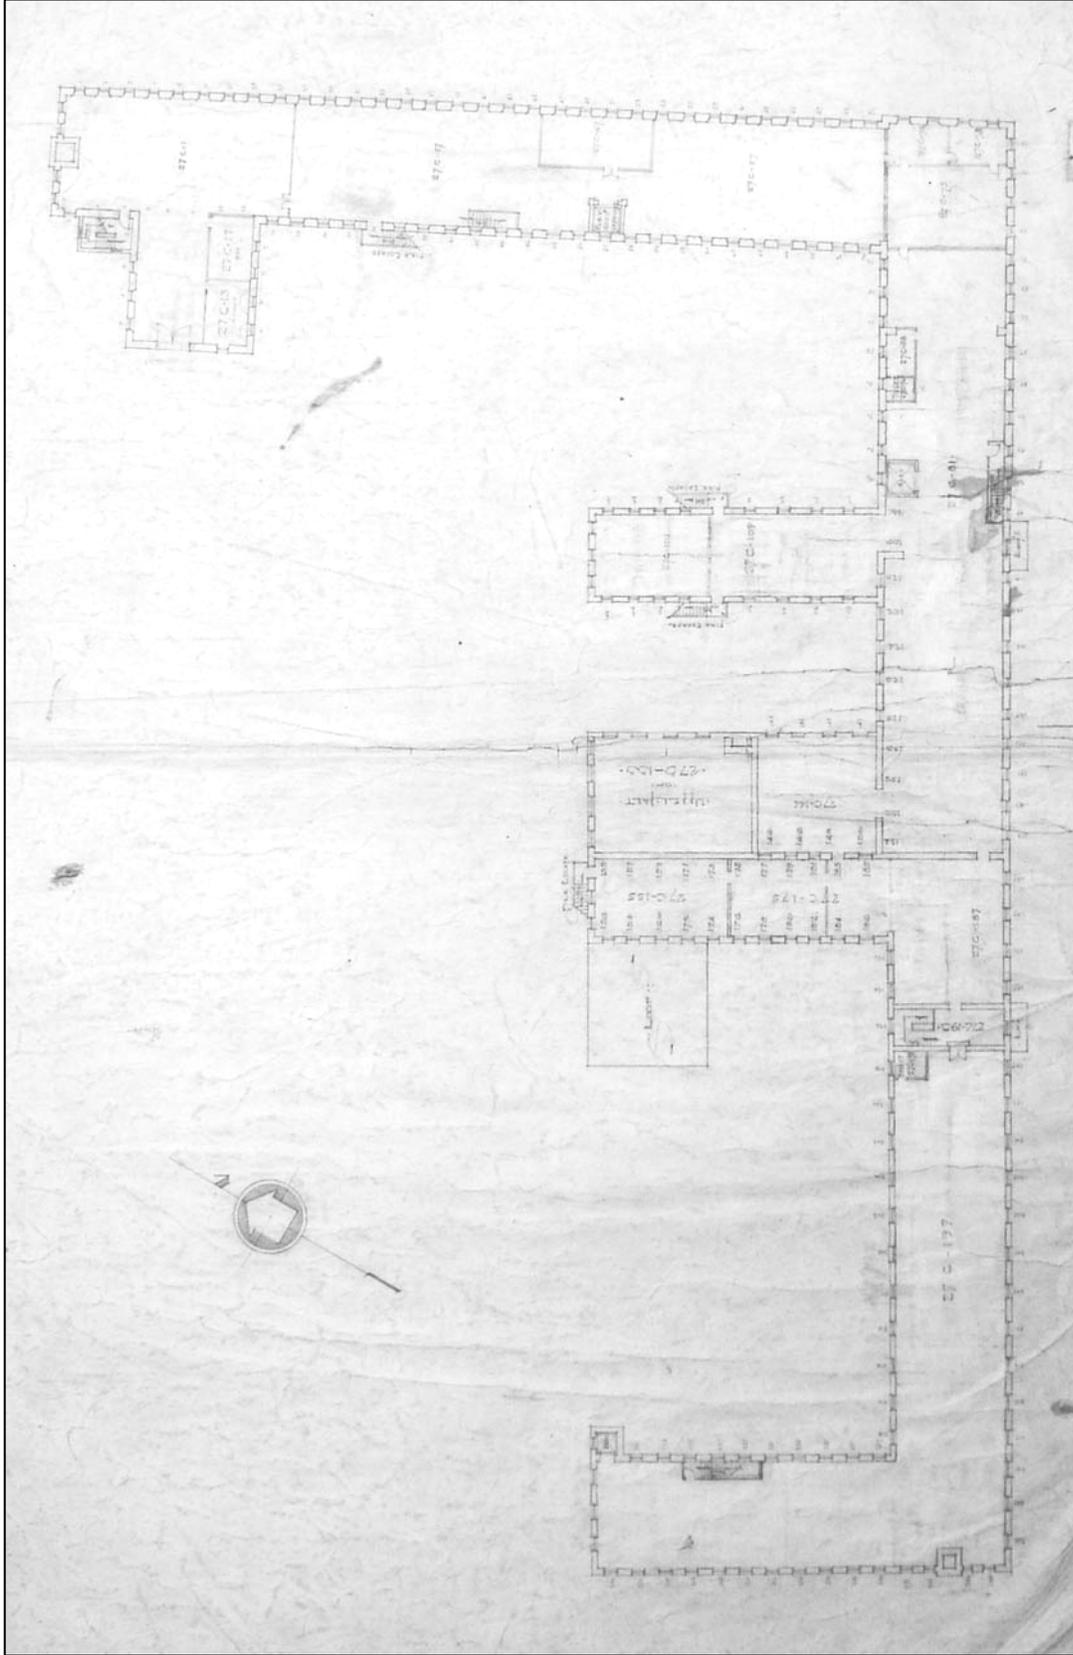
Building No. 27, Floor "C," Third Floor Plan, March 1, 1941 with revisions through 1955; not to scale. Note that Floor "C" was the second story above the basement (Floor "A") and is currently referred to as the second story.
